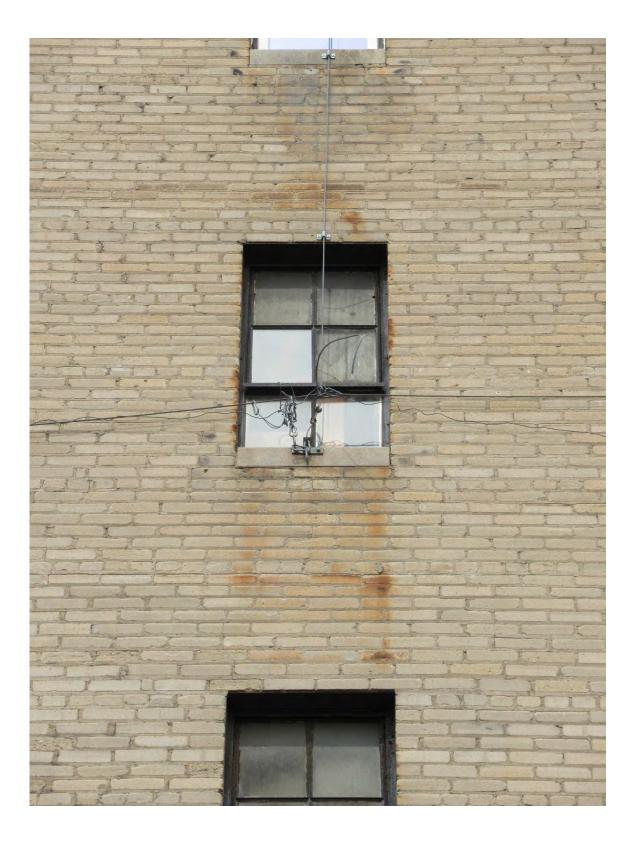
Exterior, West Façade, Looking Up. 6/26/2019
